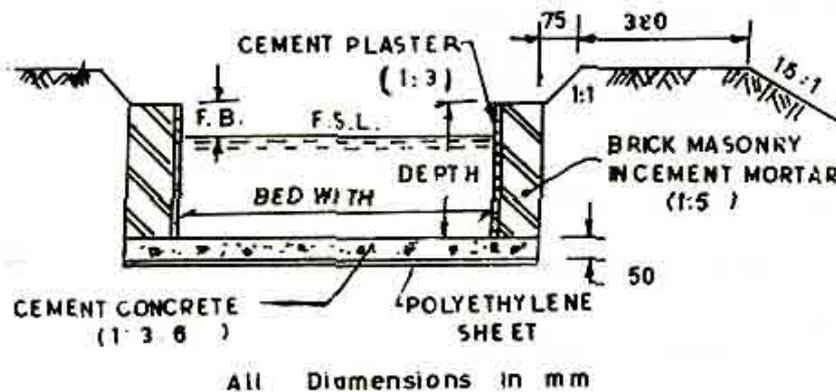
Typical Cement Concrete And Brick Masonry Section
